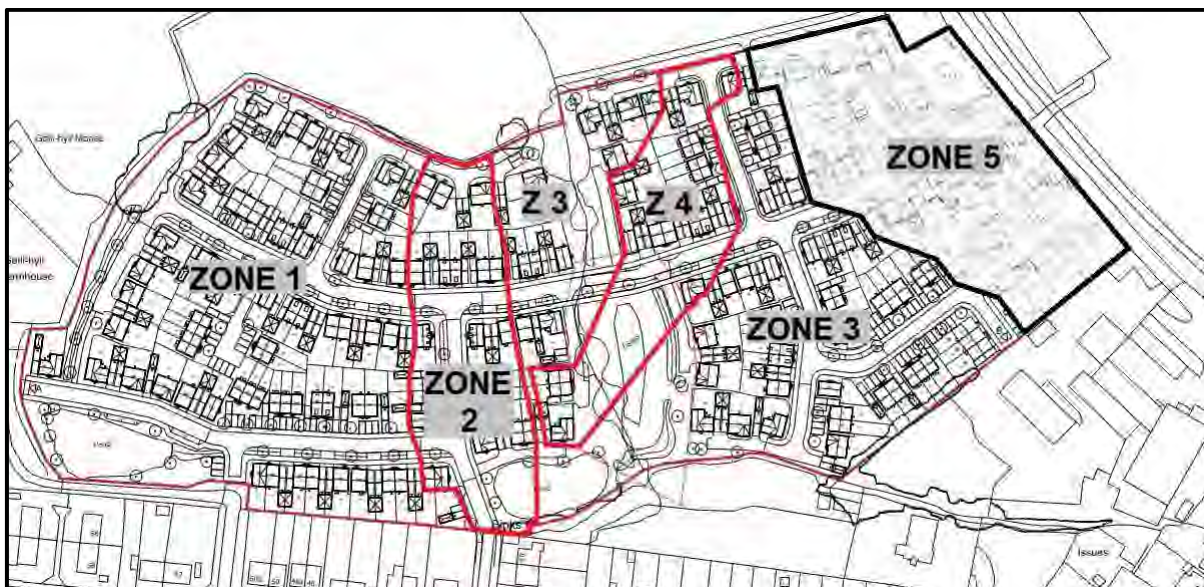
Foundation Zones and Proposed Layout (Not to Scale)
